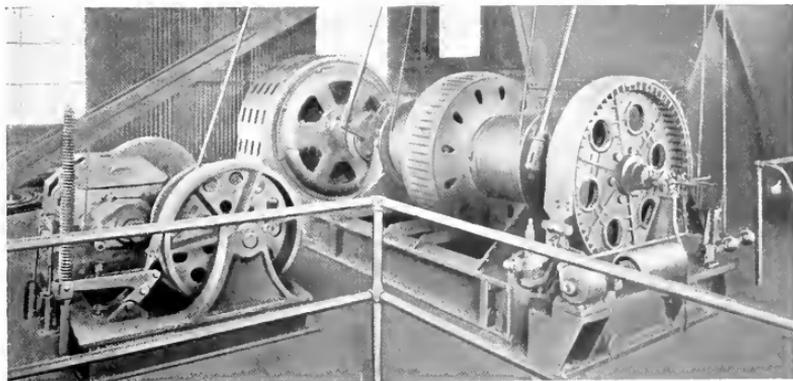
Hoisting Machinery for Tower Shown in Fig. 3
